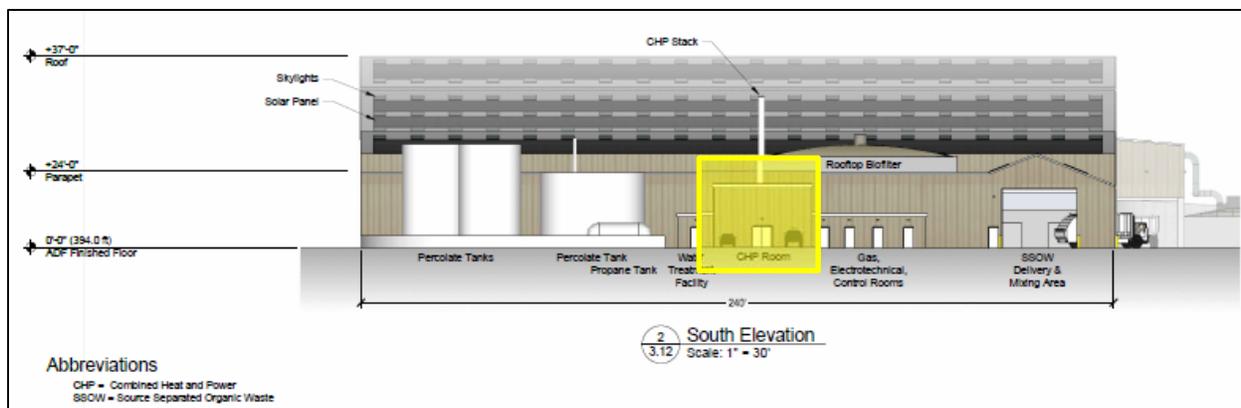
South Elevation View of the Proposed TRRP AD Facility (Source: County of Santa Barbara, 2013)
